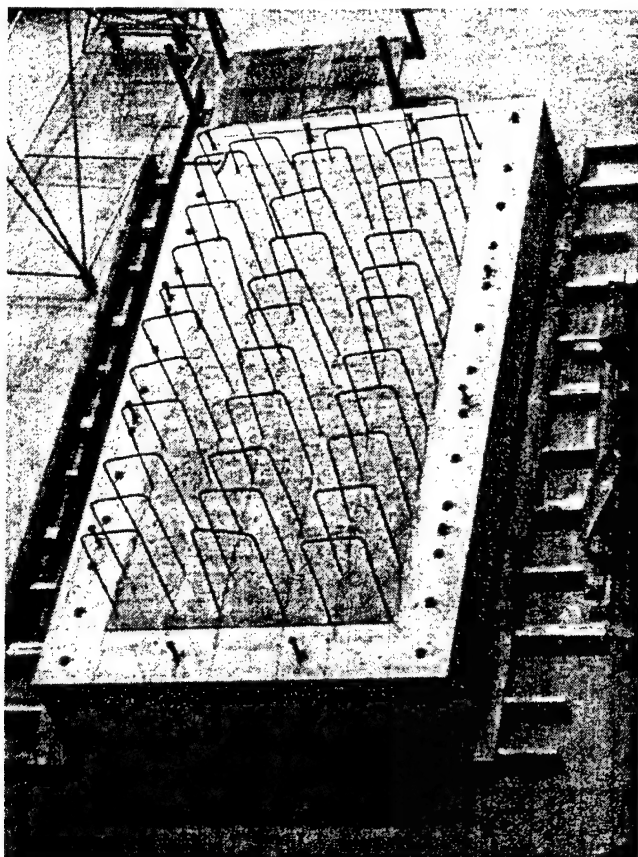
Base beam before attachment of longitudinal reinforcing steel and model formwork.
